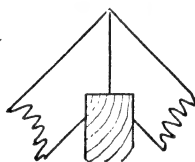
Bird's-mouth Joint for Roof with Low Ridge.
